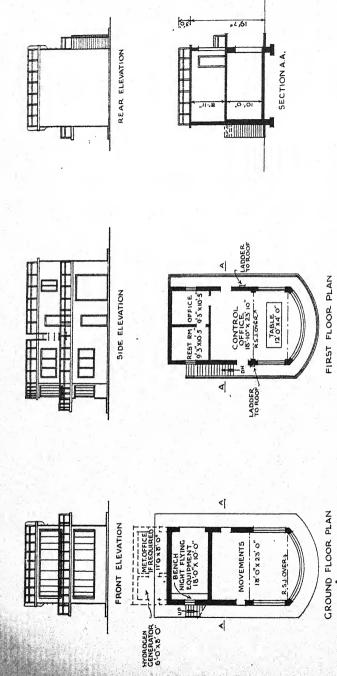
,—CONTROL TOWER—TYPICAL ACCOMMODATION OF SMALL INSTALLATION
